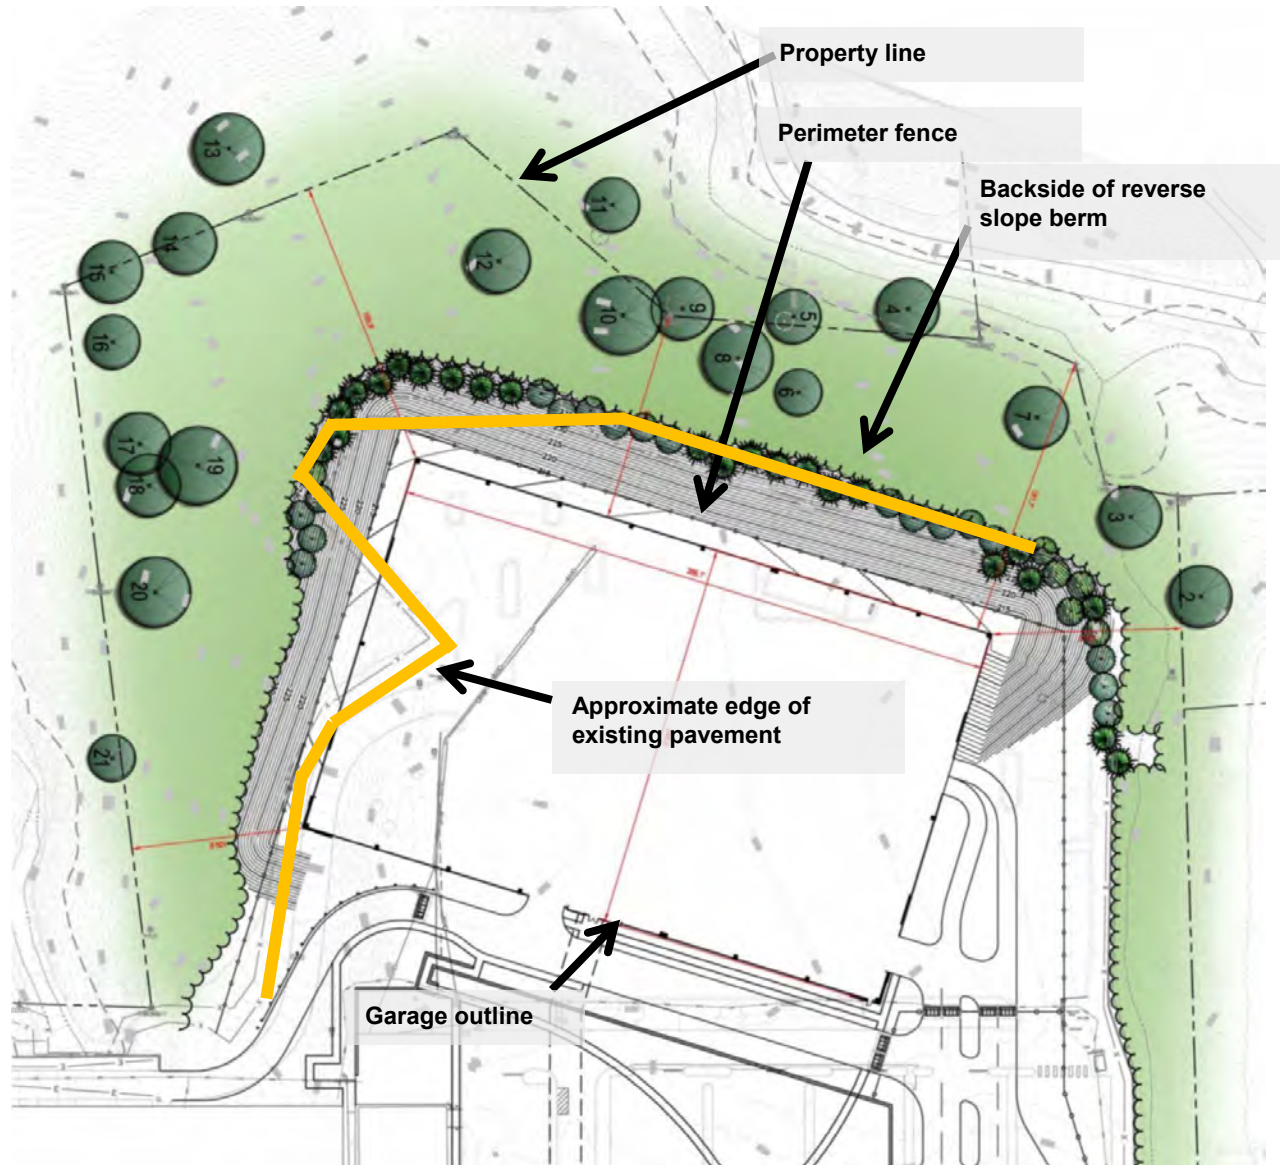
Proposed garage site plan. The top of the reverse slope berm is proposed to be planted with a row of evergreens. The site's perimeter fence is pulled close (approximately 15 feet) to the garage with the clear zone between the fence and garage wall and upon the backside of the reverse slope berm. The edge of the existing pavement is roughly outlined by the orange line. Specimen trees are depicted as dark green circles; the current project proposal does not remove any specimen trees.
